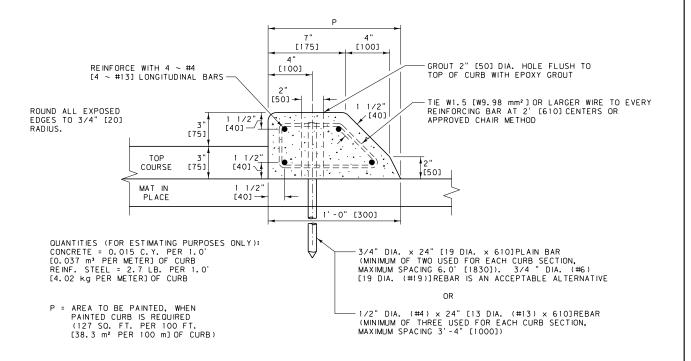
DETAILED DRAWING DWG. NO. STANDARD SPEC. SECTION 609 609-07
